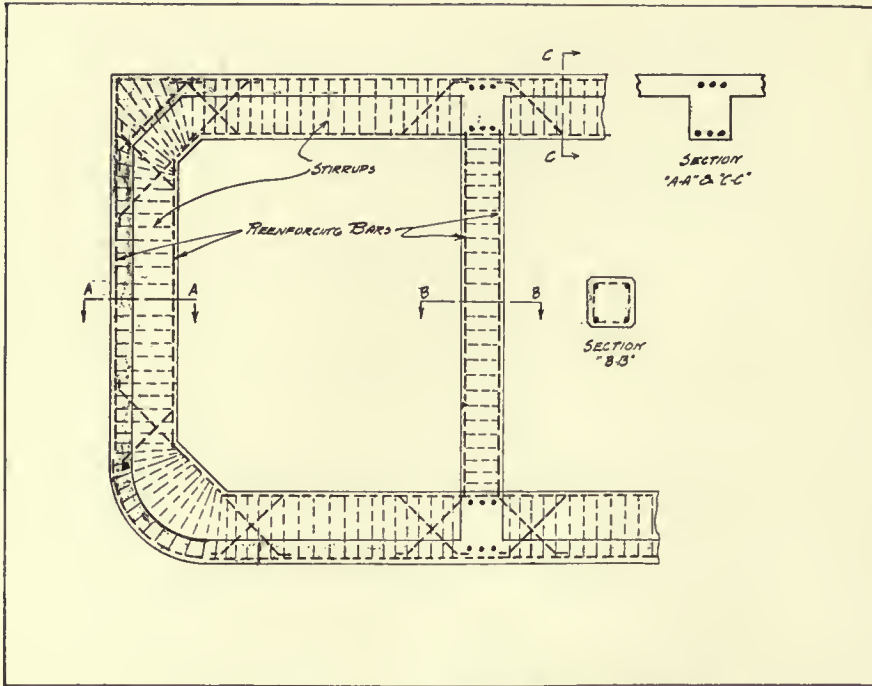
CONSTRUCTION OF STANCHIONS AND GIRDERS
